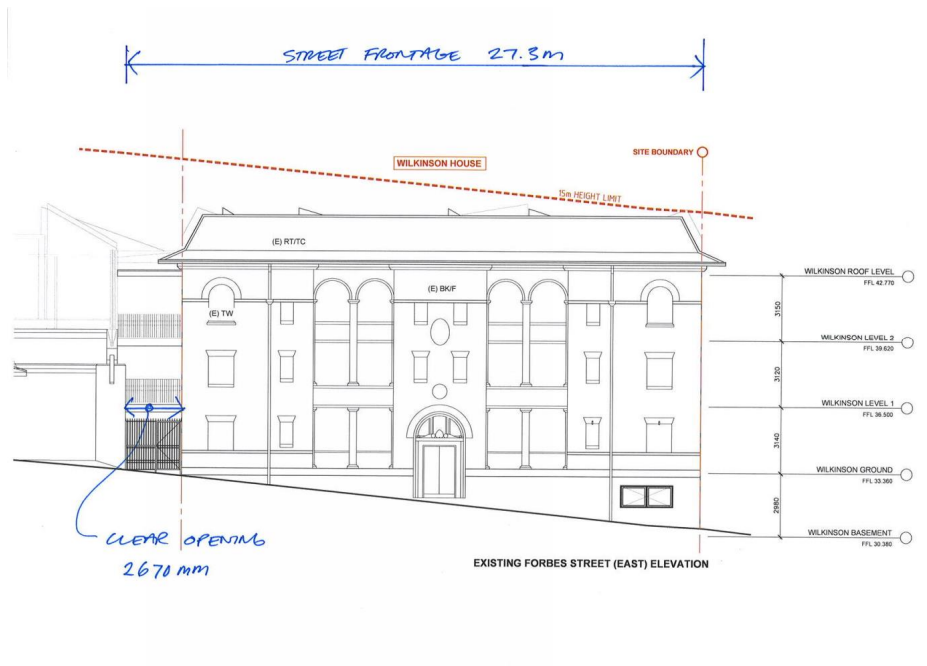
Wilkinson House, Forbes Street Elevation, Clear Opening Offset from Adjacent Sports Hall
